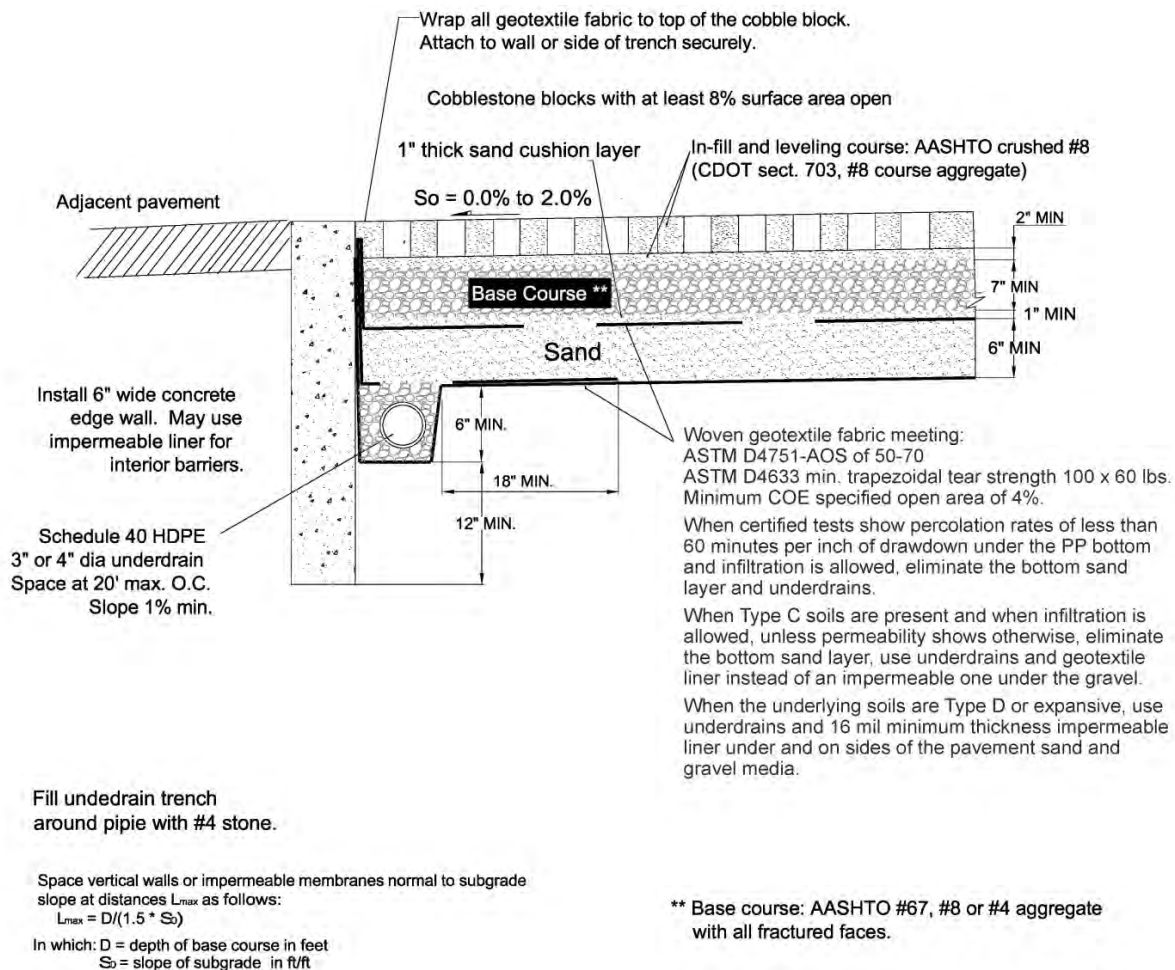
Cobblestone Block Pavement, Typical Section
